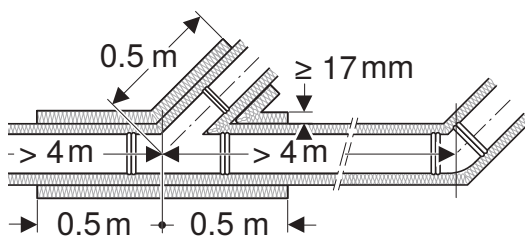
Reduced branch fitting 45°, pipe length greater than 4 m, with additional insulation
